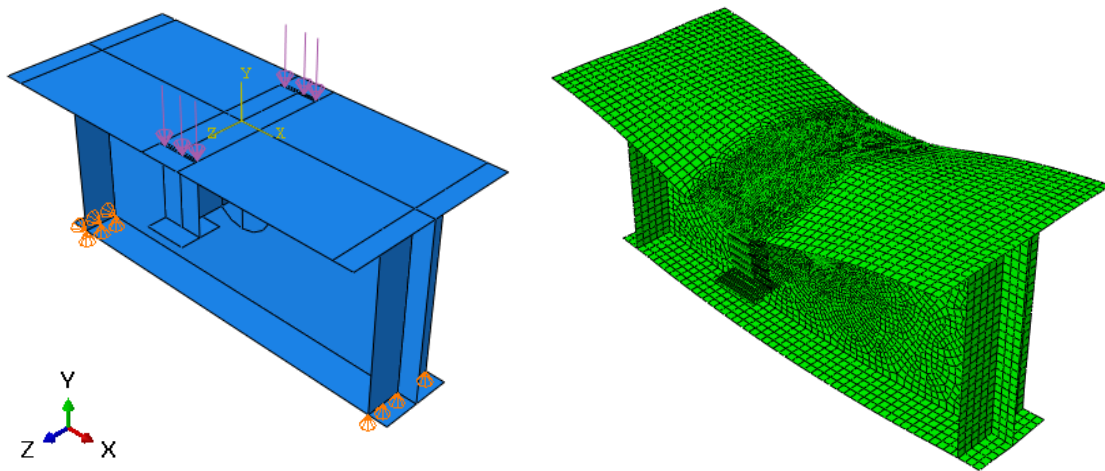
In-plane behaviour of the crossbeam: loading and deformed mesh
